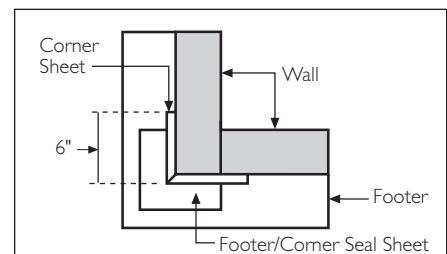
A – Corner Sheet Installation, From footer to 6" from grade
